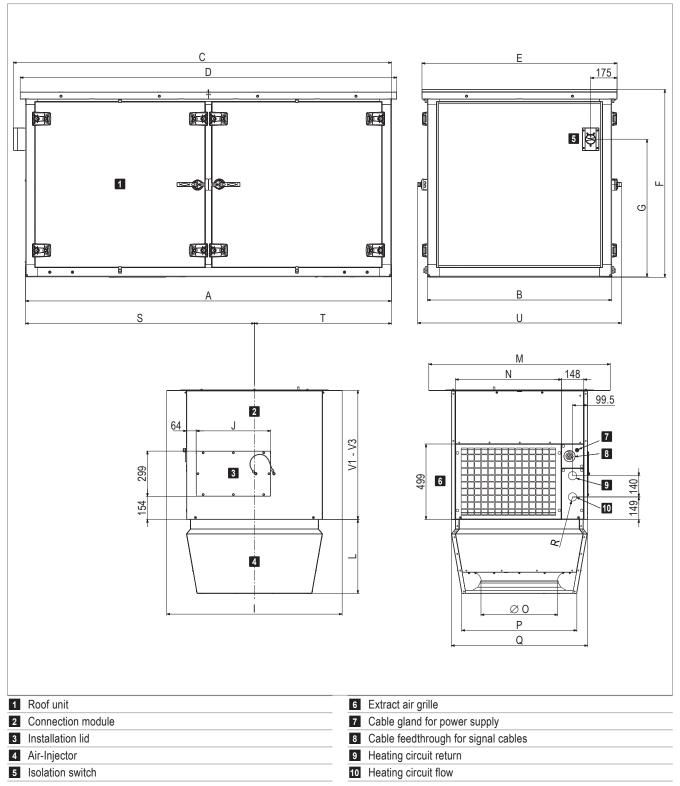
Dimensional drawing for TopVent® CH with hydraulic assembly throttling circuit (dimensions in mm)
